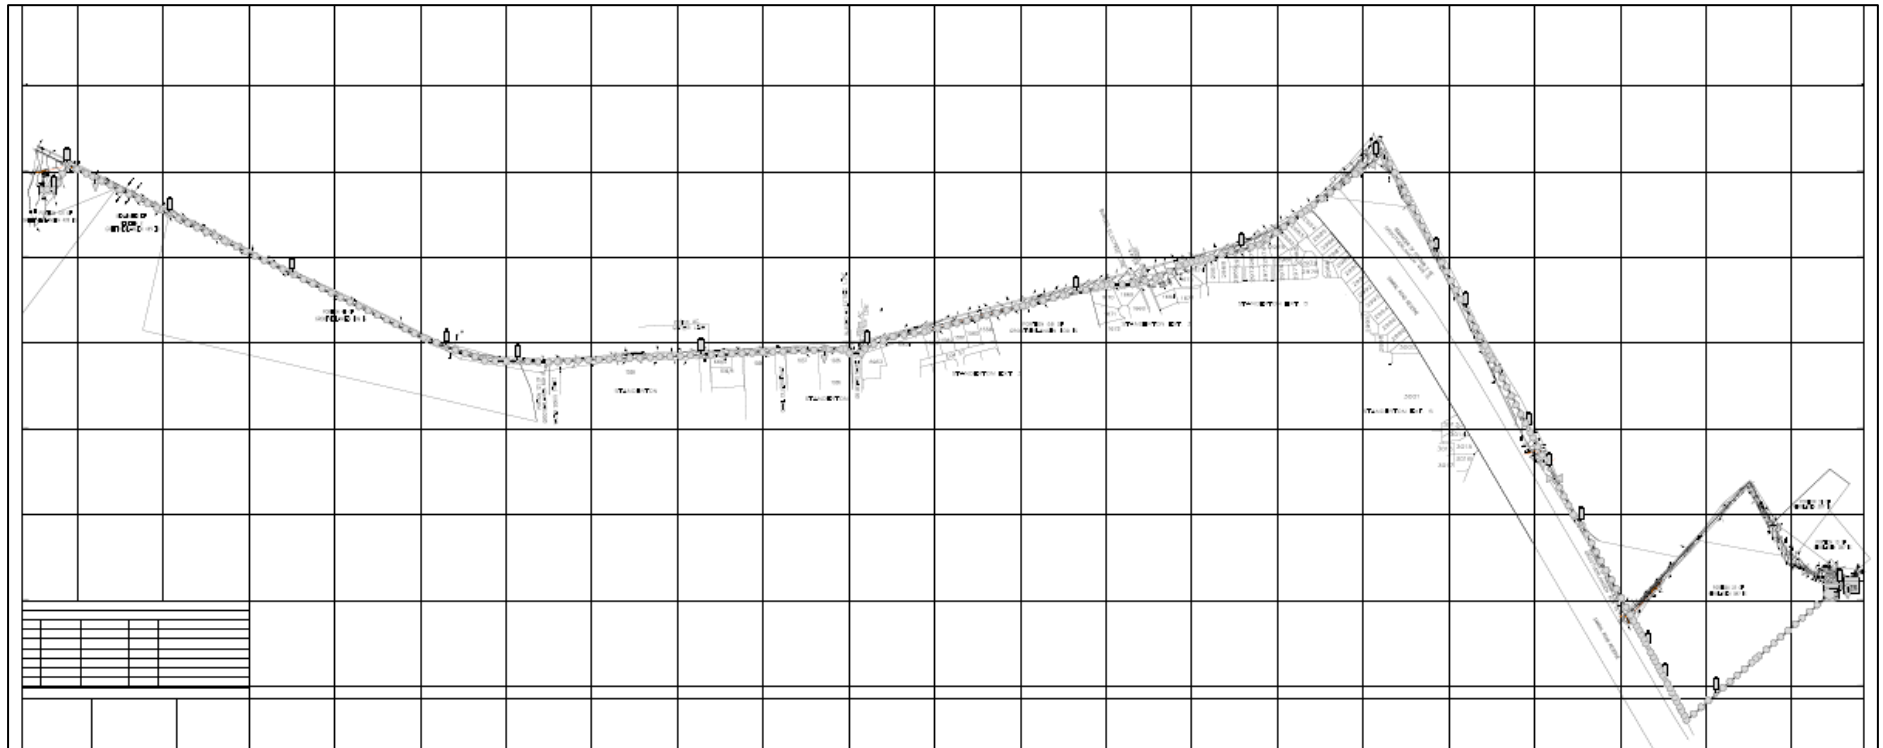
Proposed Site layout (refer to Appendix 4)
